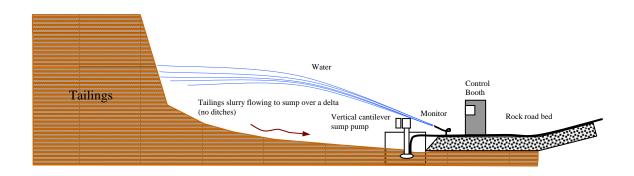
Undercutting mining method for areas where top access is not possible due to saturated tailings
